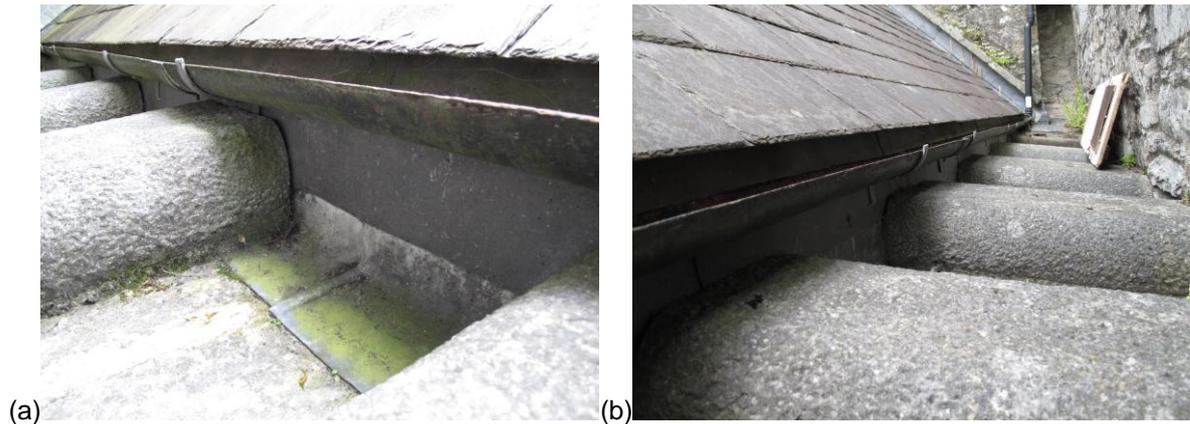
Close up views of drainage gutter, lead flashing and counter flashing, waterstones and capping saddle stones
